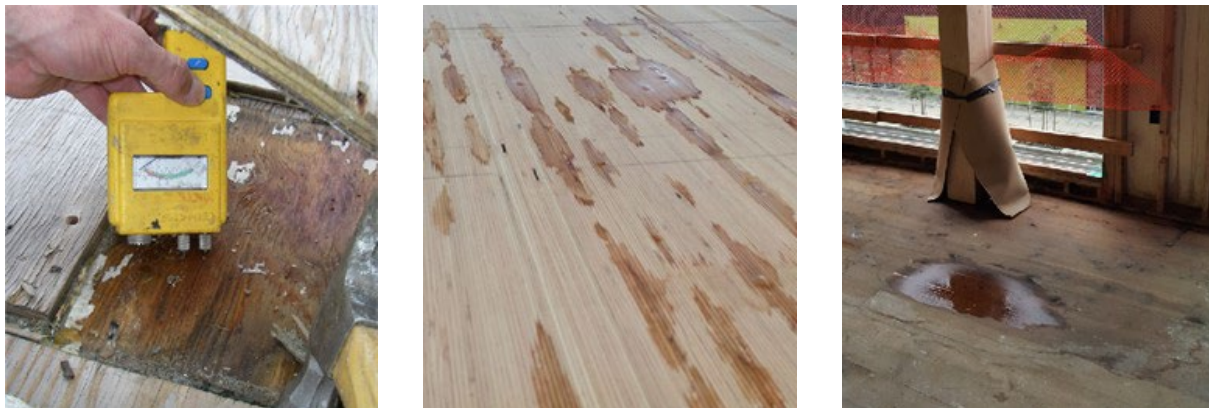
Various results of poor construction moisture management, including wetted and stained plywood (left) and LVL (centre), and ponding water and staining on a CLT floor panel (right).
